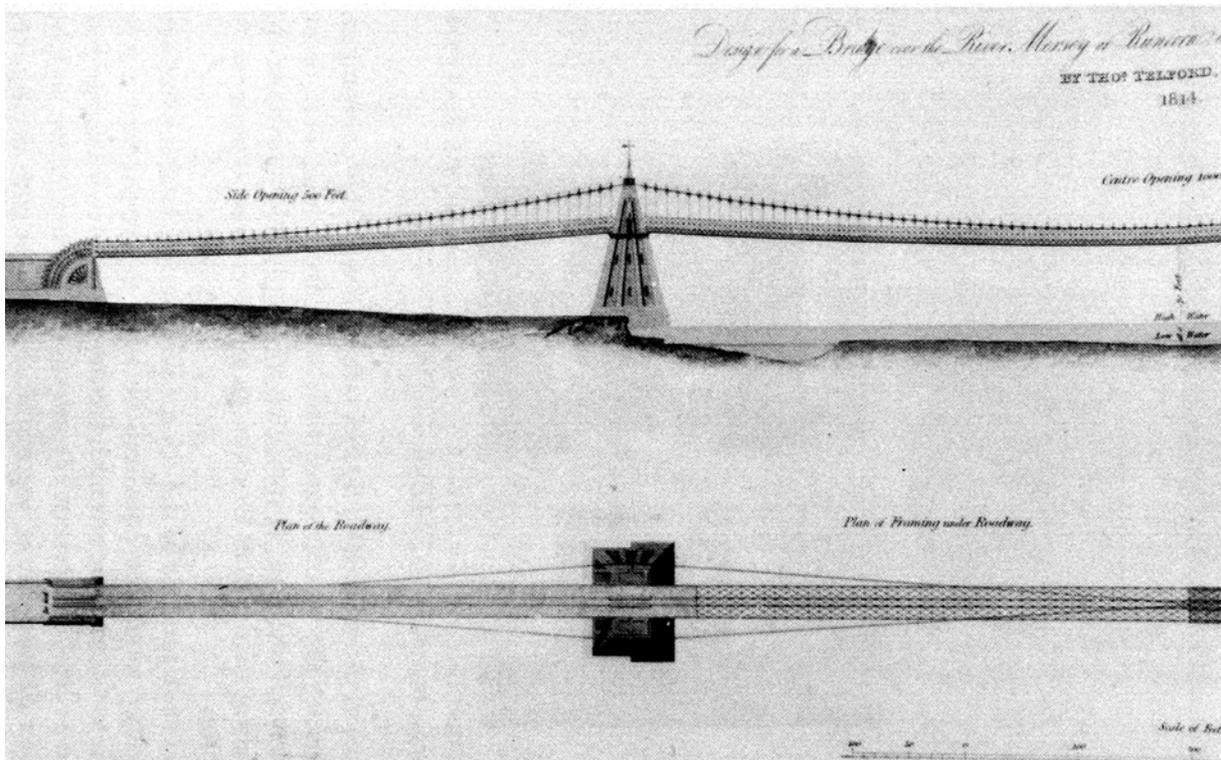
Telford's 1814 proposal for a 609.6 m (2000 ft) long suspension bridge at the Runcorn Gap with a 1000 ft. center span. Elevation and plan from anchorage to centerline. (Penfold, after Rickman)
